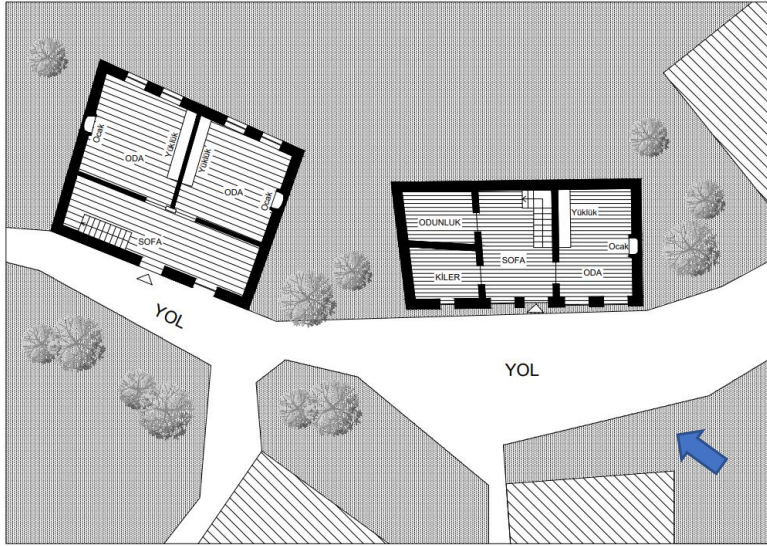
An Example of The Ground Floor Plan Schemes of Traditional Houses in Günyurdu Village (Buildings K51 And K52)
